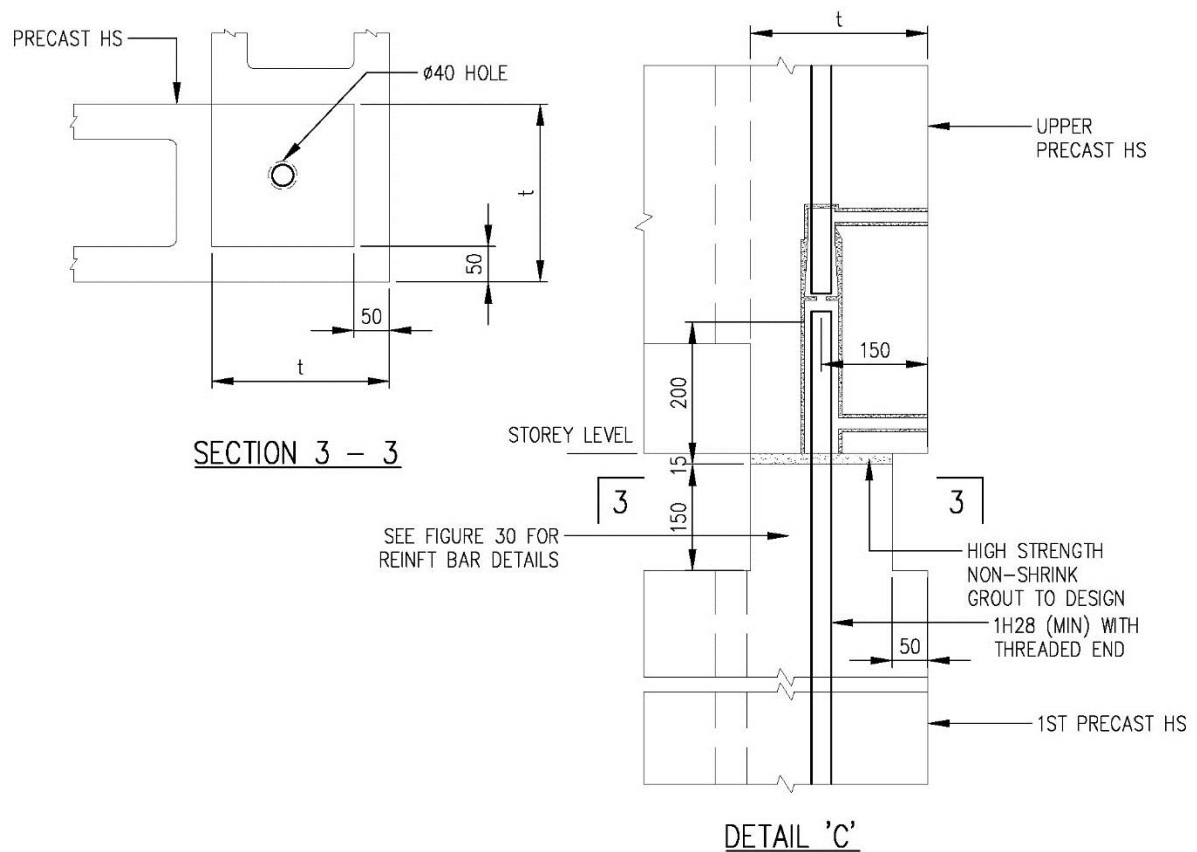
CONNECTION DETAILS BETWEEN LOWER AND UPPER PRECAST HS (DETAIL 'C')
